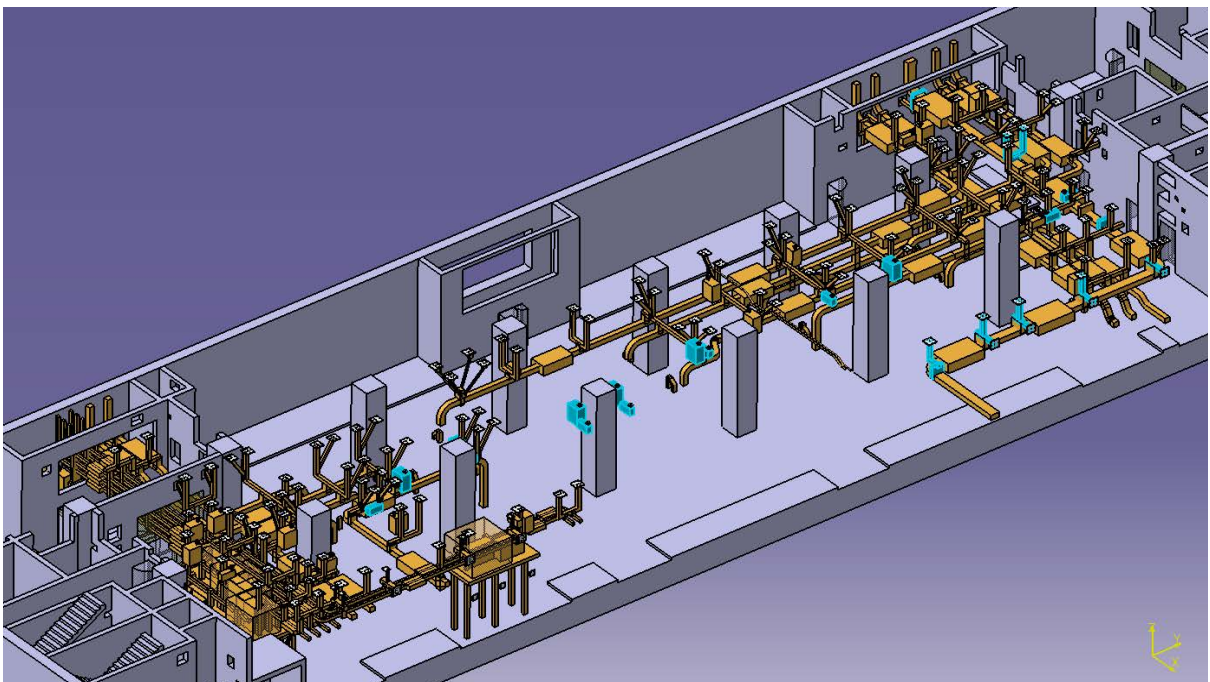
Layout of the ceiling embedded Busbars in Building 74. Level B2 [8]
